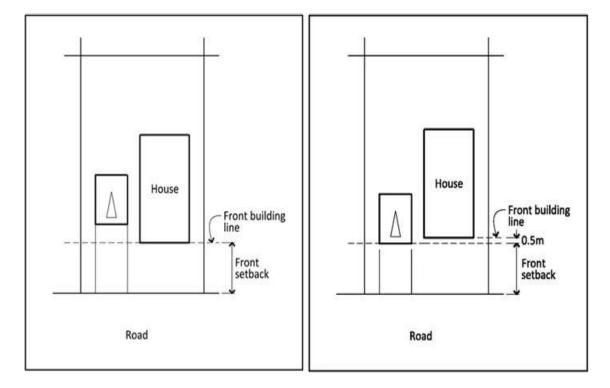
Setback for accessory buildings – example of a detached accessory building
